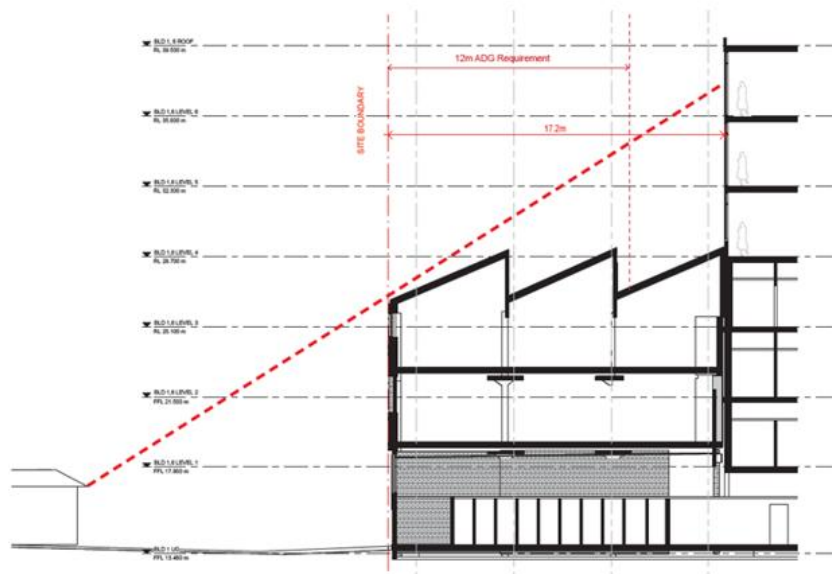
Sightlines into adjoining properties along Unwins Bridge Road. Source: Ethos Urban
